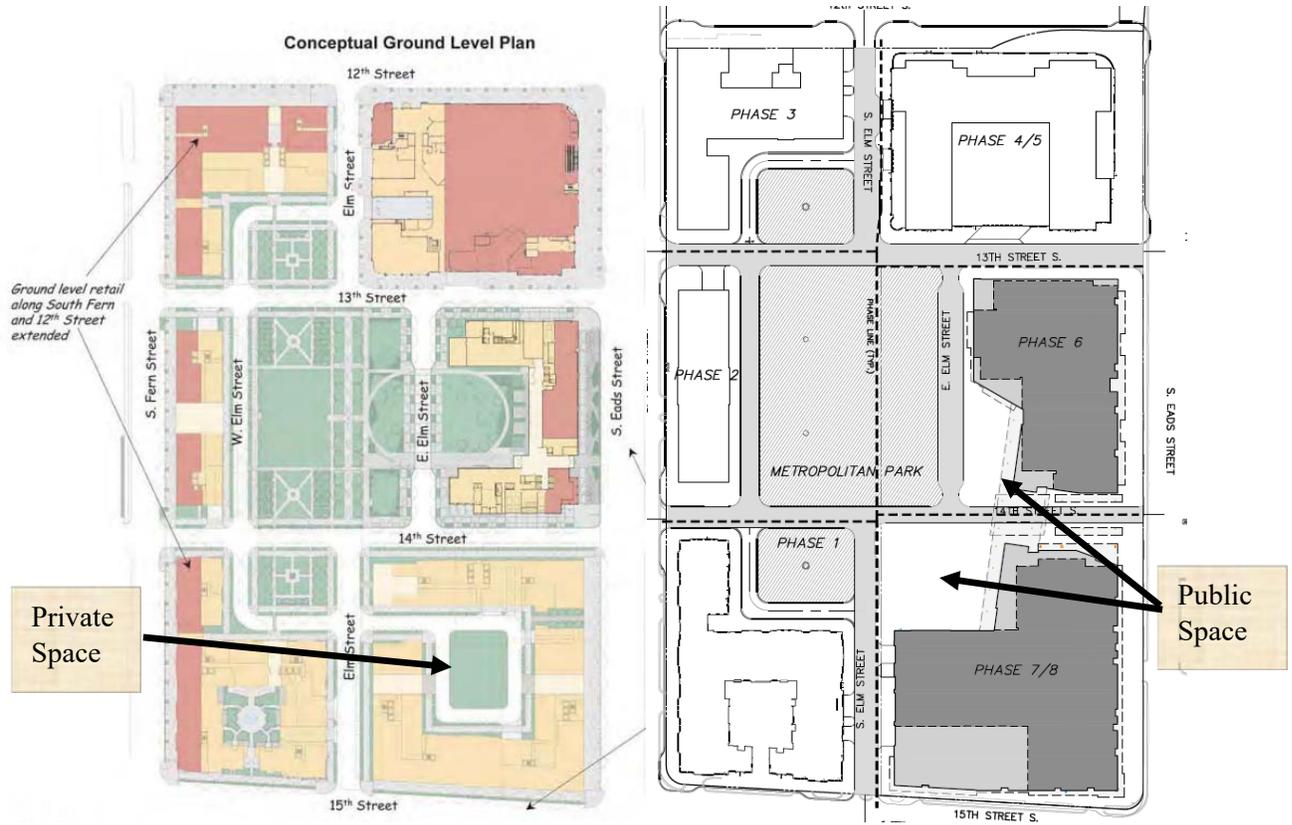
Design Guidelines (left); Applicant's proposal (right).
